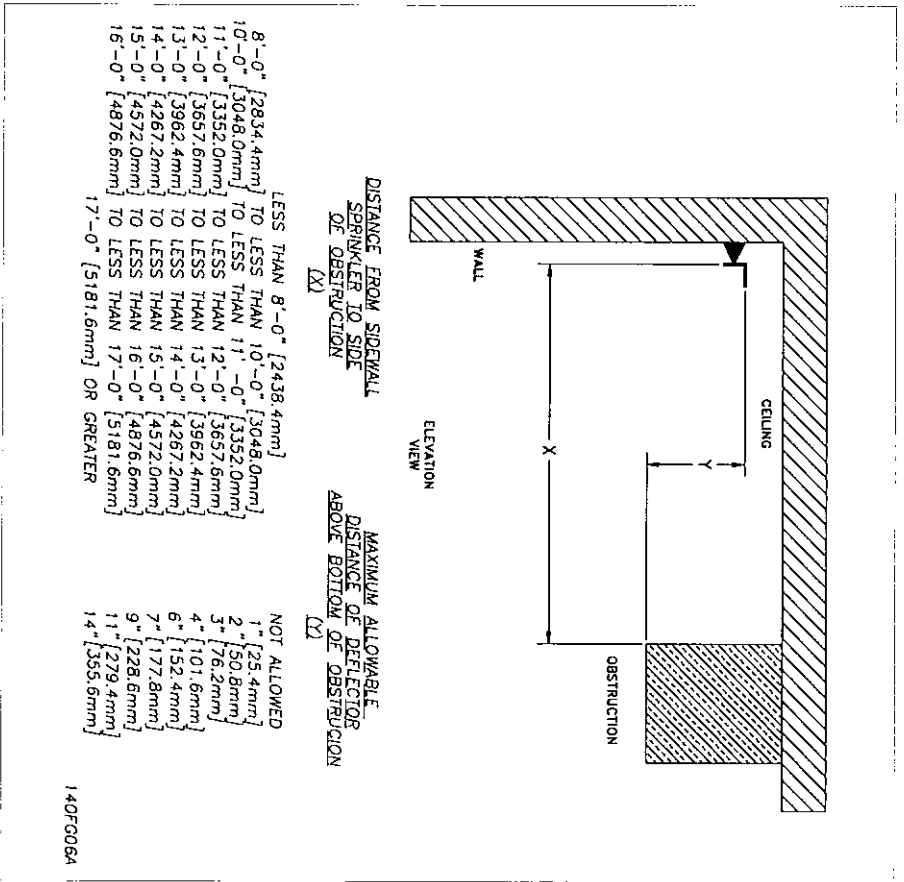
Positioning of sidewall sprinklers to avoid obstructions.
